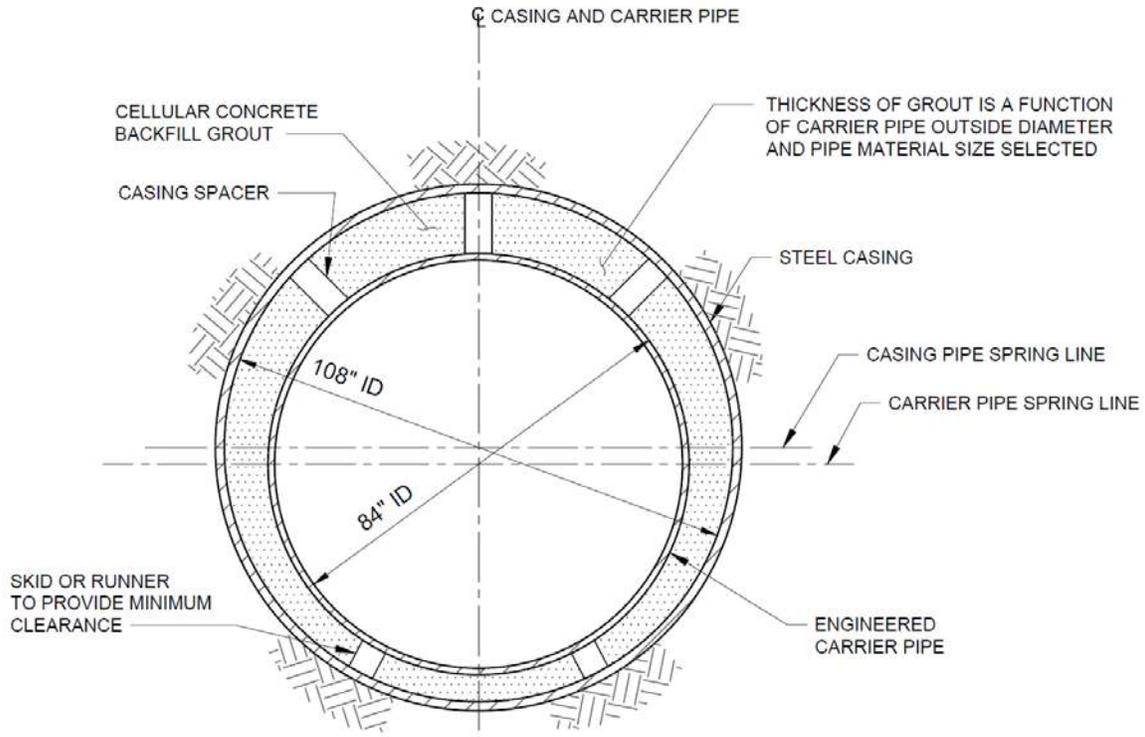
Typical casing and carrier pipe configuration for pipe jacking and microtunneling
